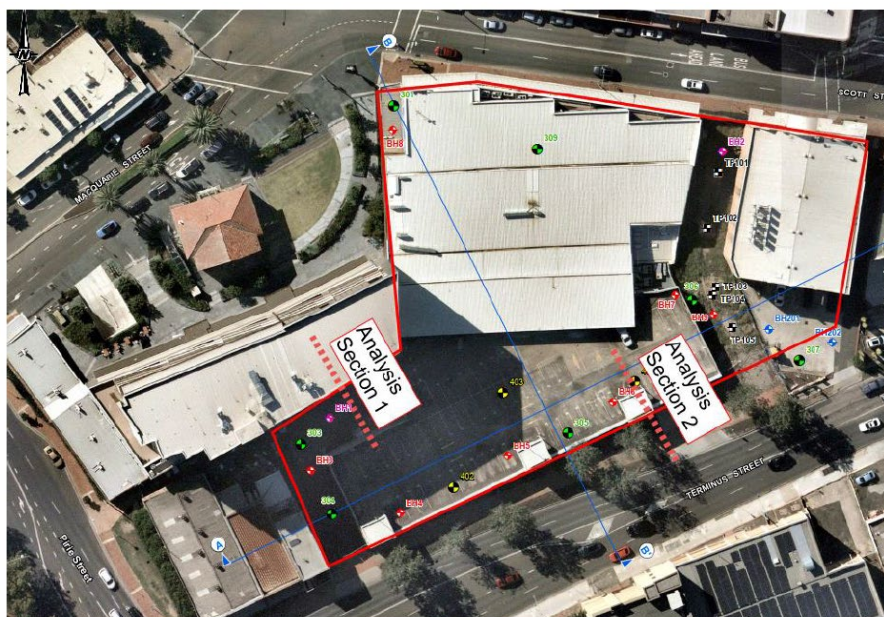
Geotechnical Analysis Section layout adopted by Golder
